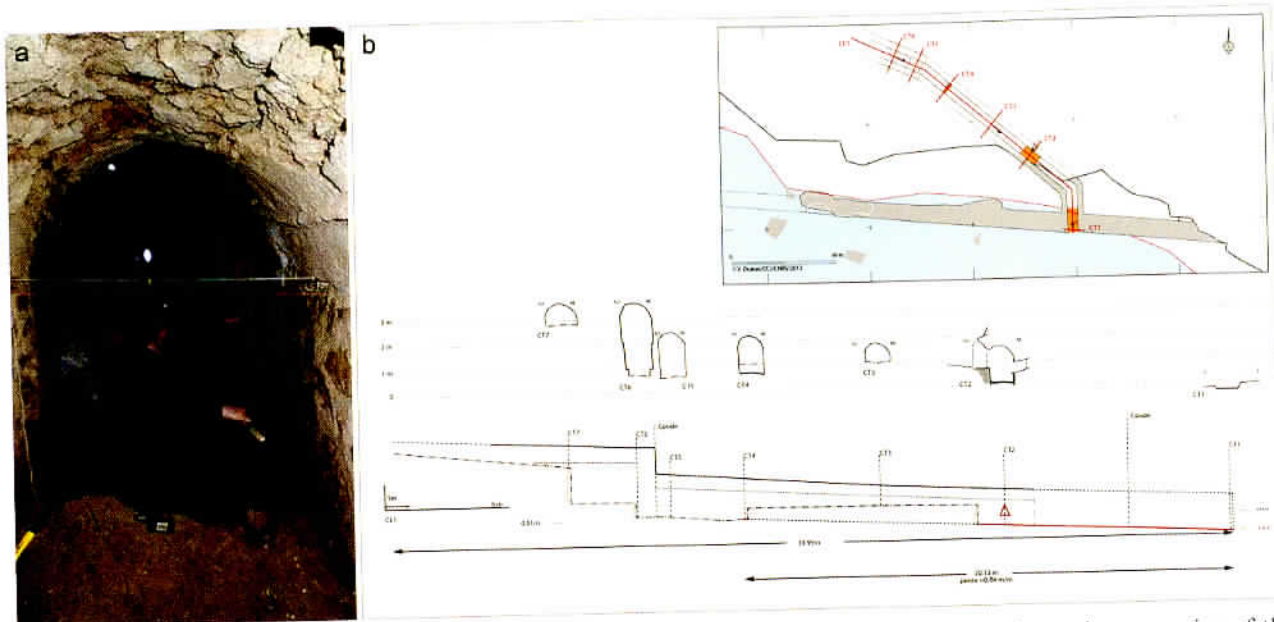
a) Measuring of the underground canal (photo Ph. Groseaux, AMU, CNRS, CCJ); b) plan and cross-section of the underground canal/tunnel (drawing V. Dumas, AMU, CNRS).
